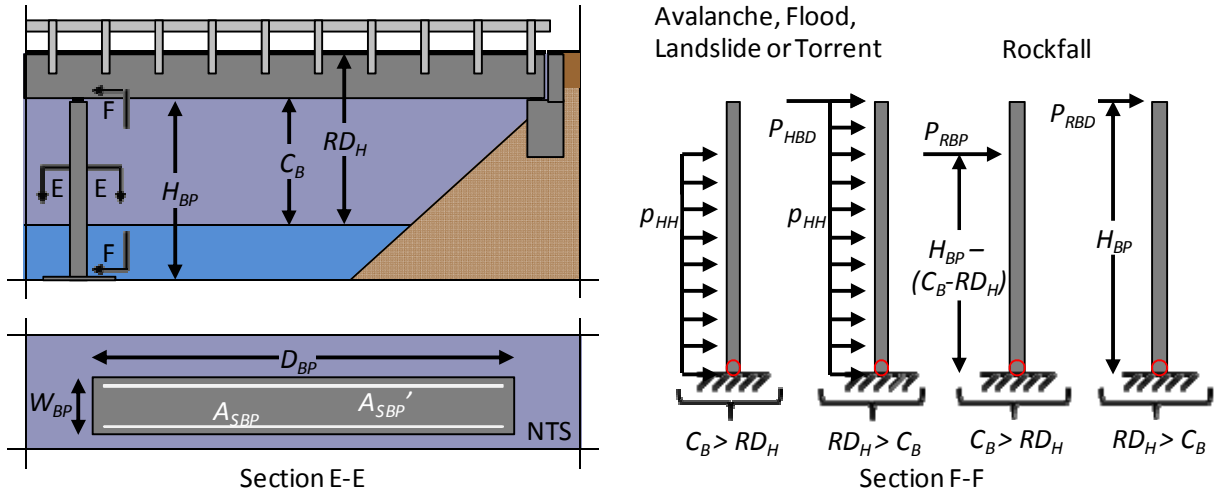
Bridge pier horizontal loading and potential flexural hinge locations.
